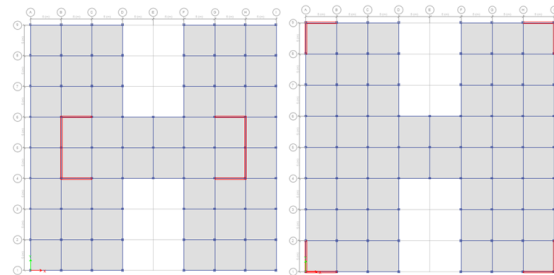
Shear wall at Location 3 Fig-4 Shear wall at location 4
